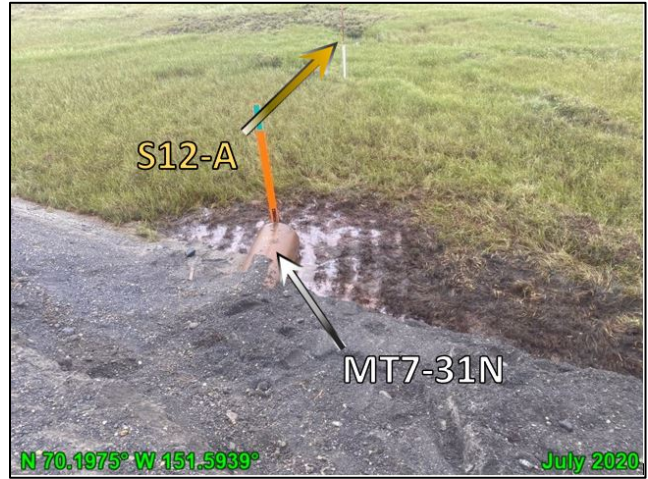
Culvert MT7-31 after souhged gravel replaced on embankment; July, 2020
